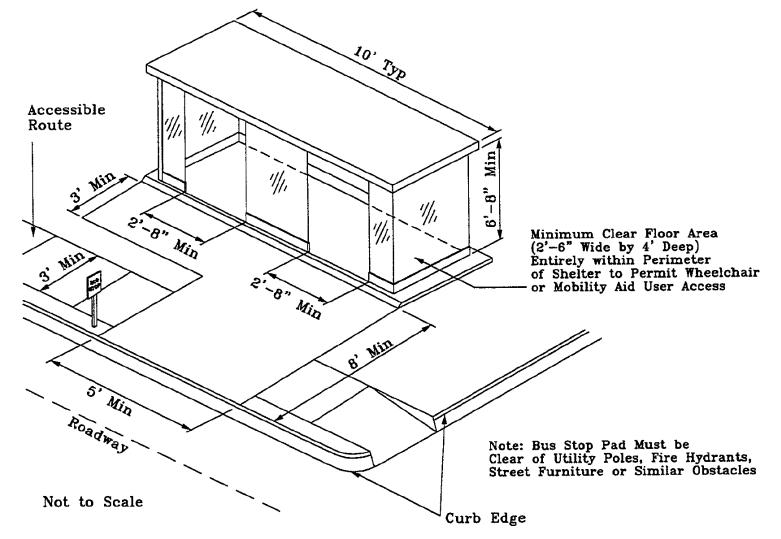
illustrates a design approach to a bus stop with a shelter that would meet ADA requirements.
